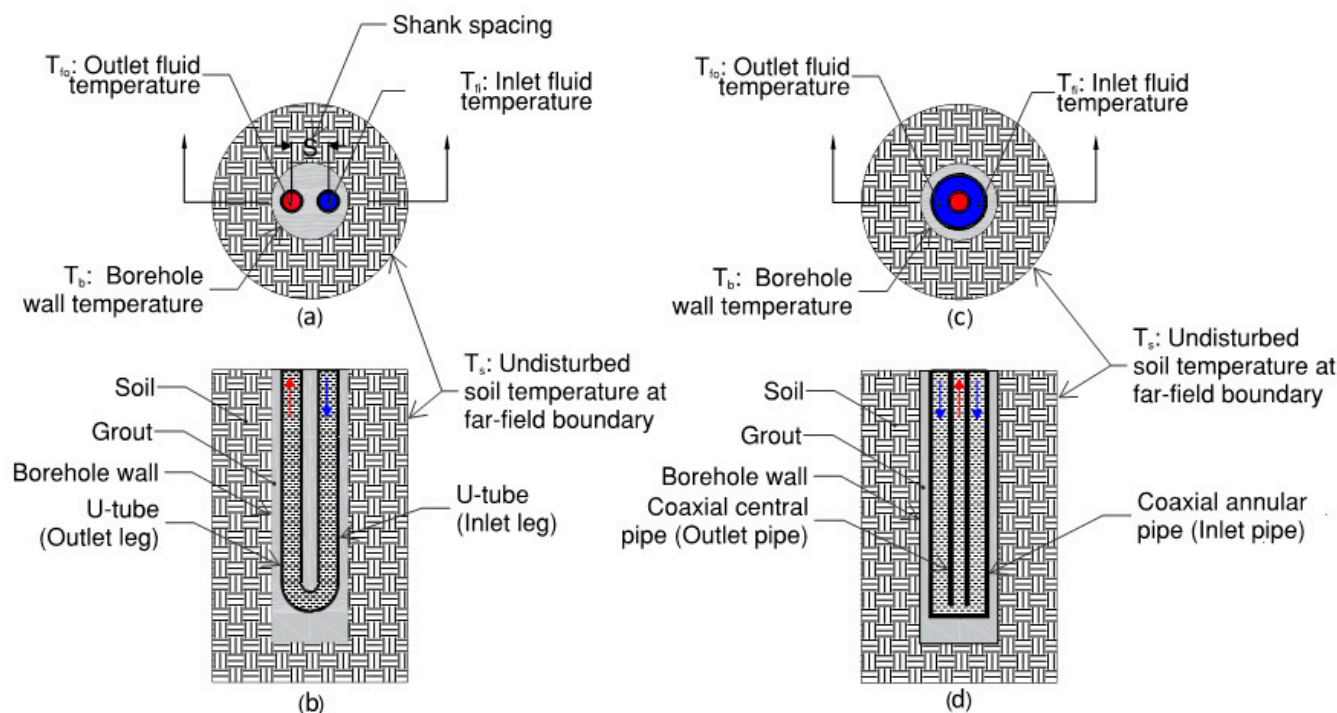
Schematic diagram showing BHX; (a & b) Plan & section for U-tube arrangement; (c & d) Plan & section for Coaxial pipe arrangement with inflow through annular pipe.
